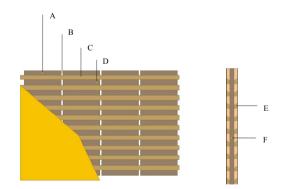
Detail of the typical timber structural system of a *tabique* wall.
